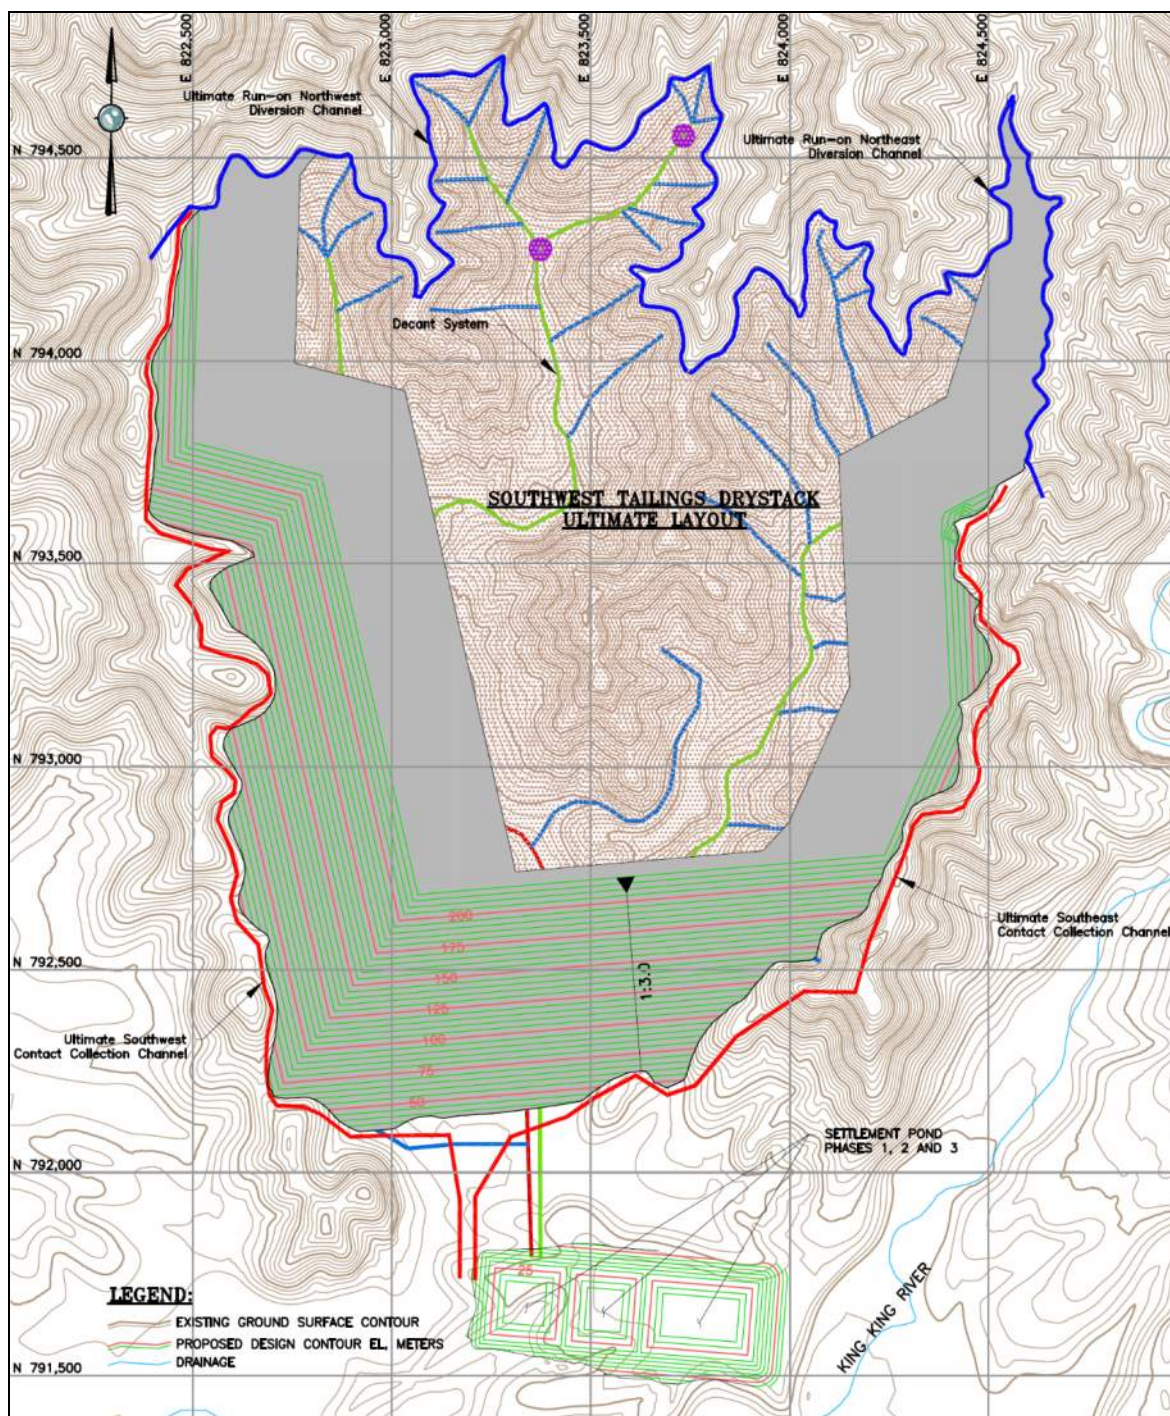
Southwest Tailing Dry-stack Ultimate Layout (AMEC, 2013)
